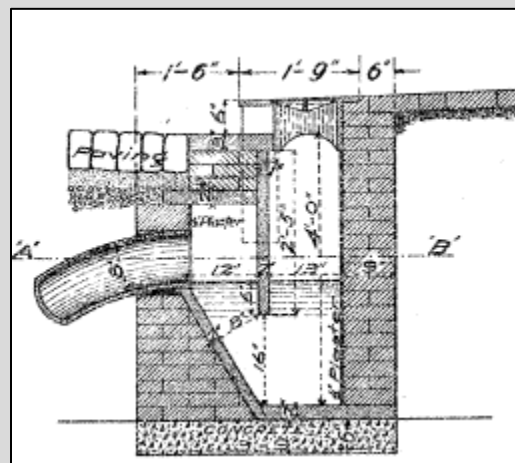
Inlet with Solid Trap Wall Standard Detail
